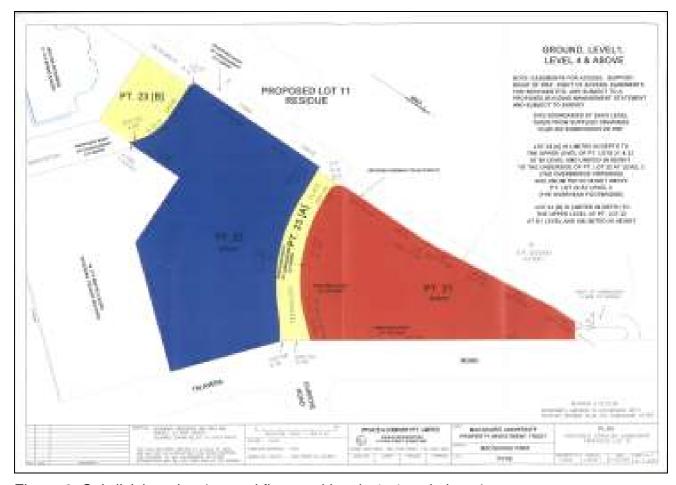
Subdivision plan (ground floor and levels 1, 4 and above)
